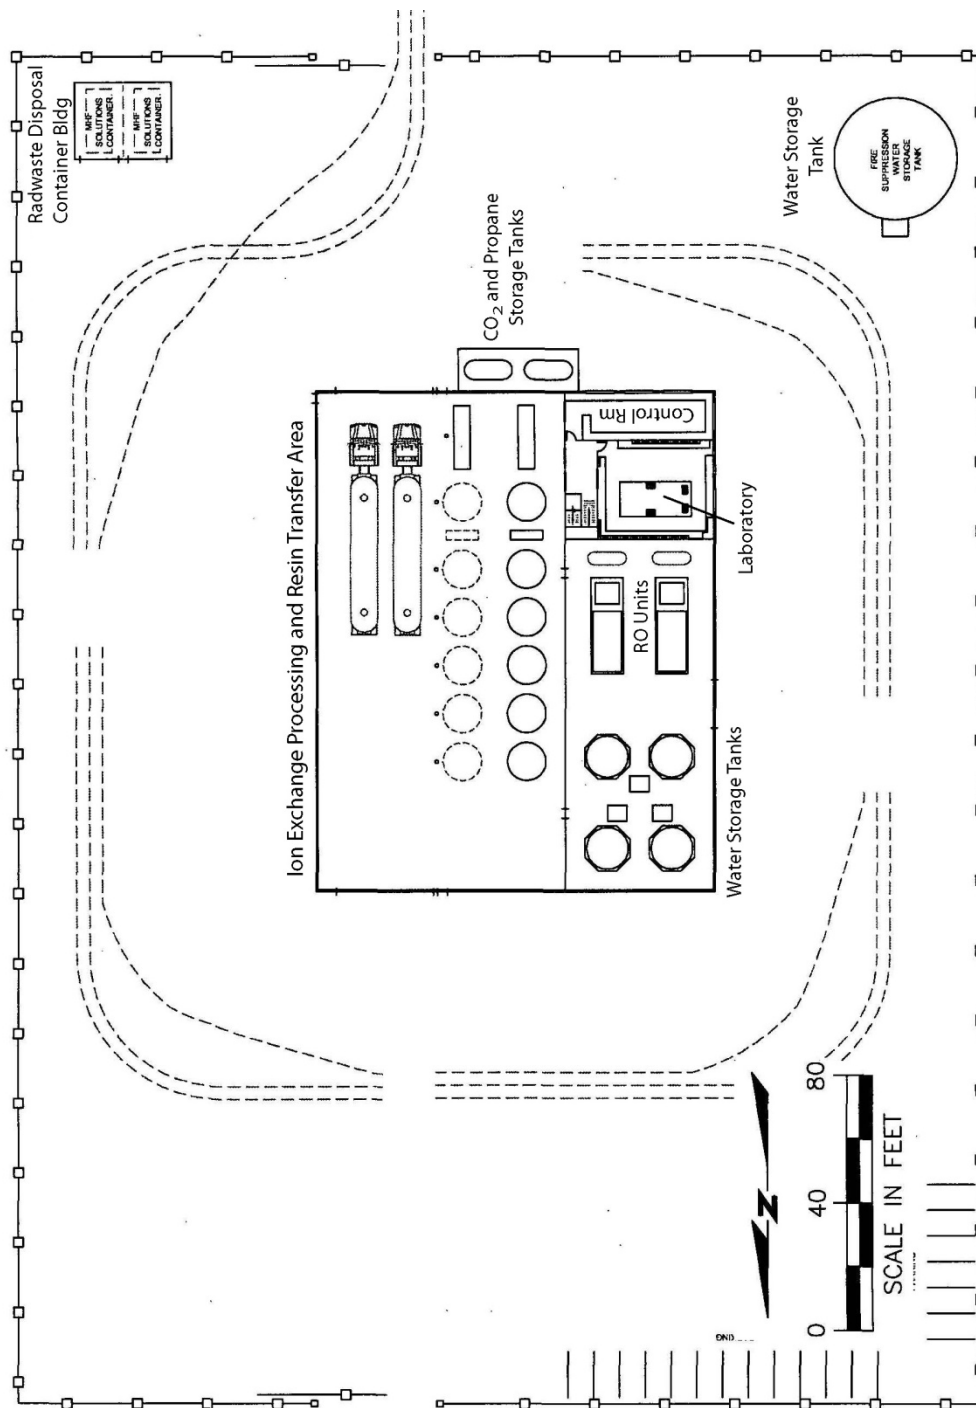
General Site Plan for the Dewey Satellite Facility.
